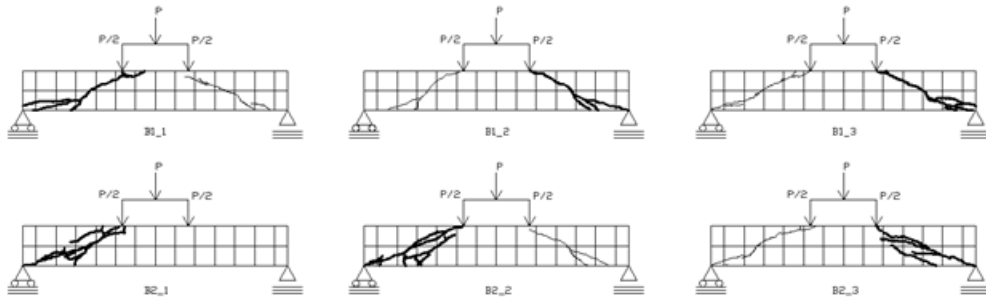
Crack patterns in RC structural elements after shear failure.
